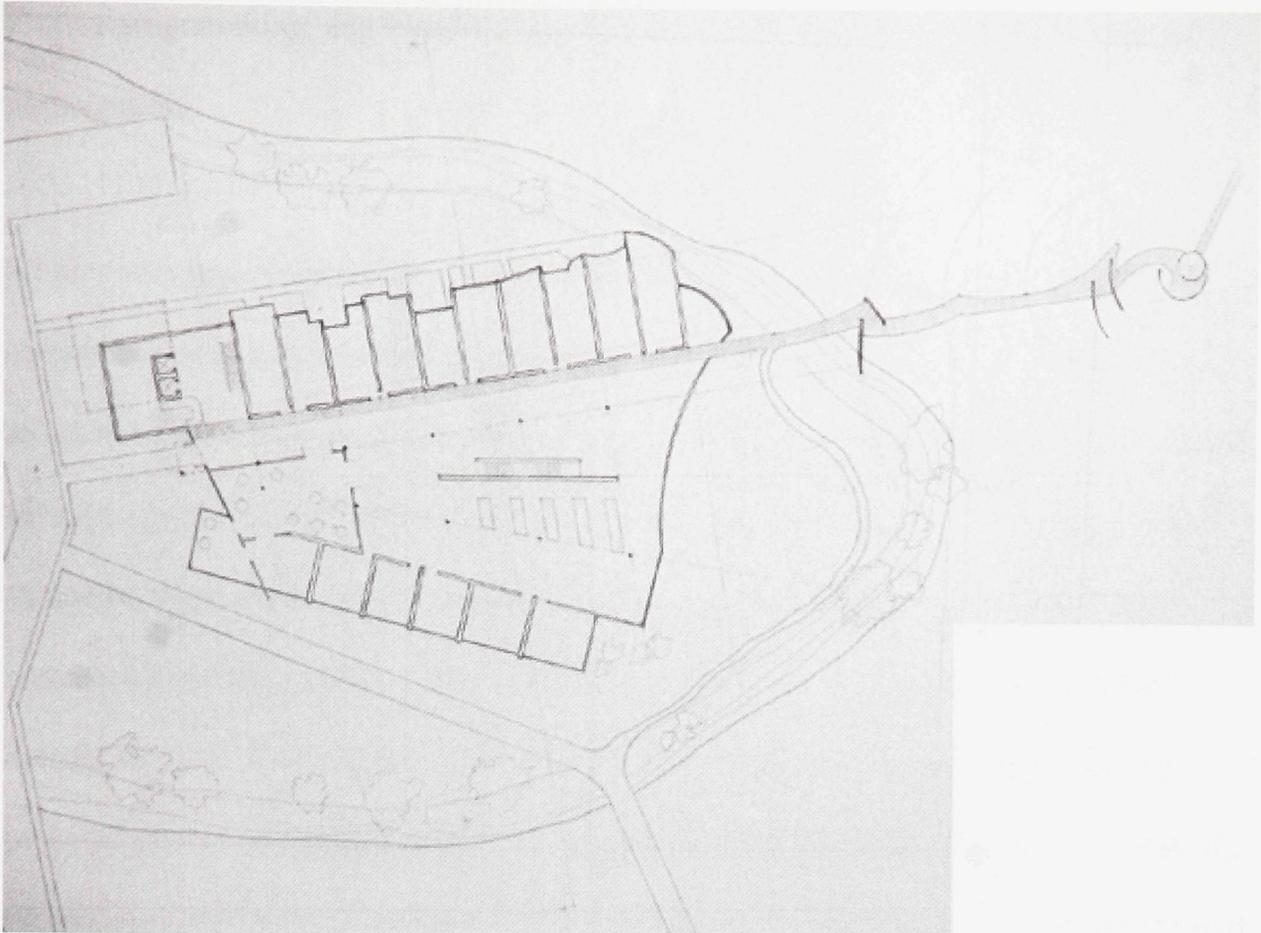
preliminary design plan – the plan opens up to the point of the island focusing on an outward projection and embracing more natural views
